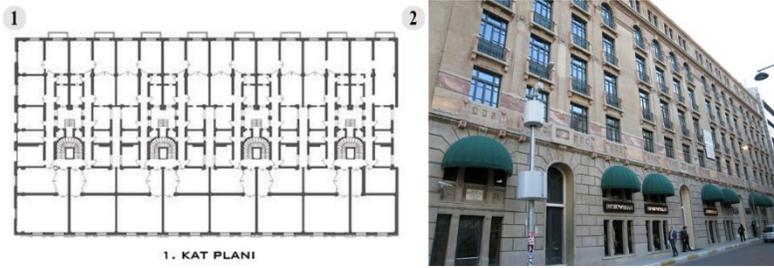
Maçka Palas, Teşvikiye Floor plan (Görgülü, 2016)
